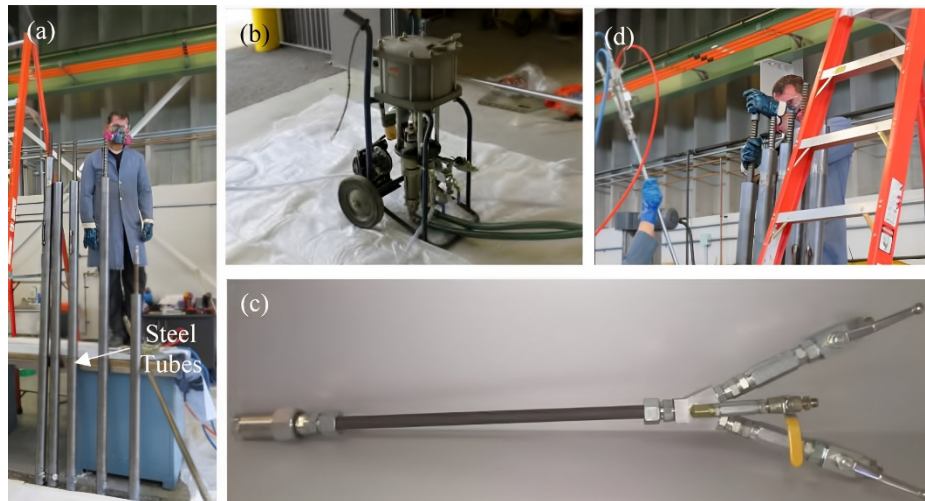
Installation of SDDB: (a) Vertical set-up of the specimens during the installation of the urea-silicate injection resin; (b) The twin-piston pneumatic pump; (c) The nozzle/mixing and head unit; (d) installation of the coupler on the threads of the SDDB
